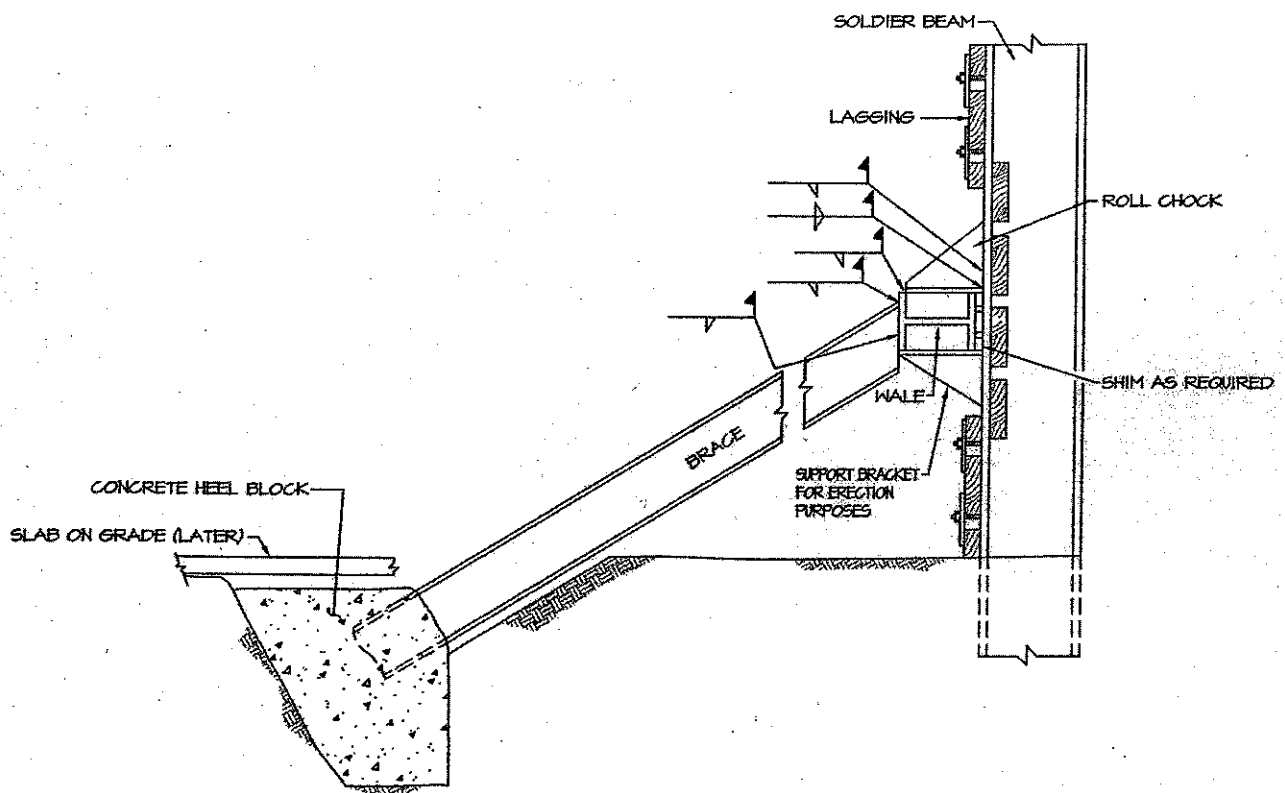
Typical connection of raker to waler. Note the use of a roll chock which prevents the waler from
